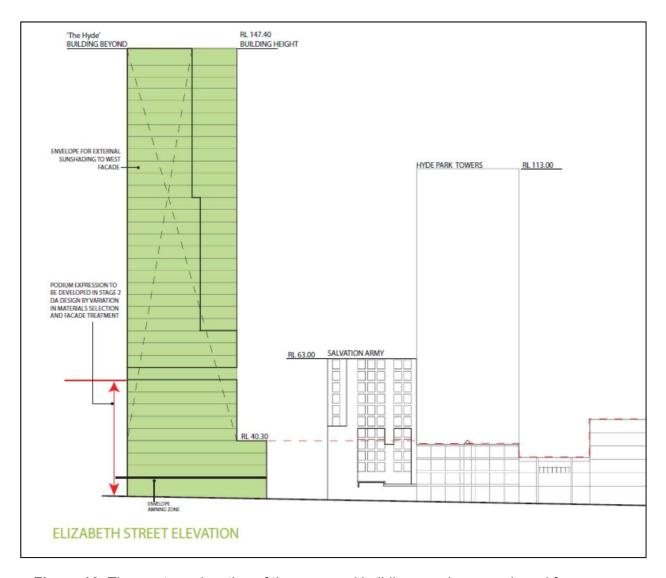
The western elevation of the proposed building envelope, as viewed from Elizabeth Street
